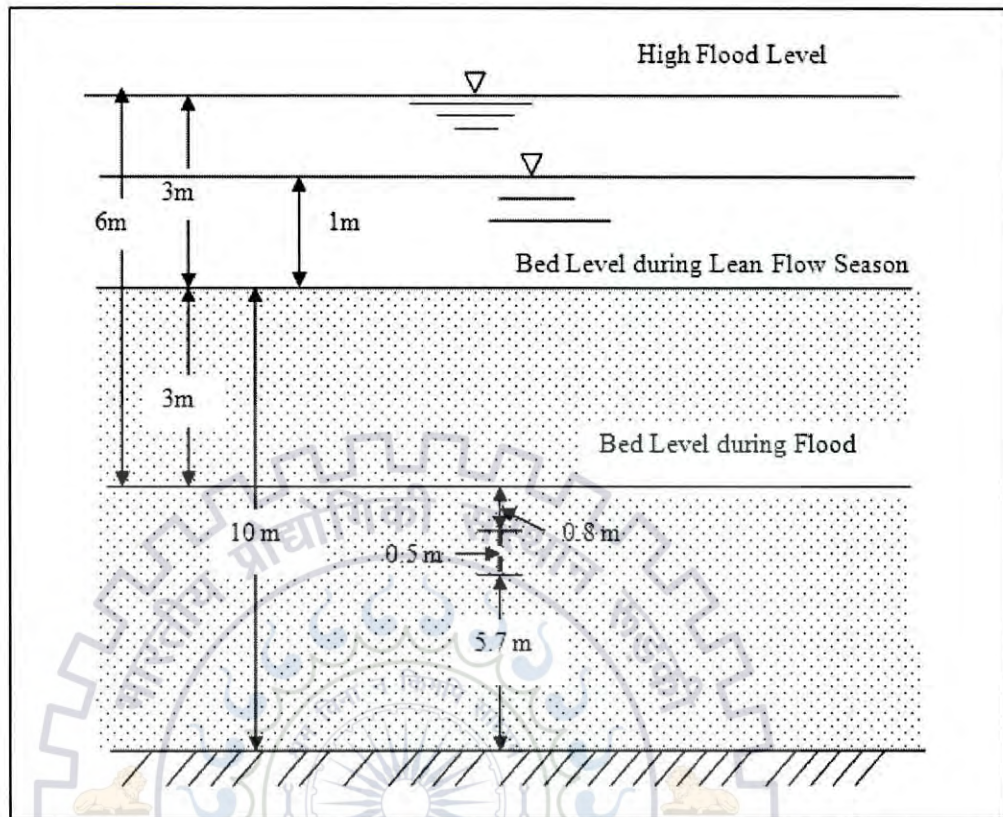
Example of Collector Pipe Installed Under Riverbed
